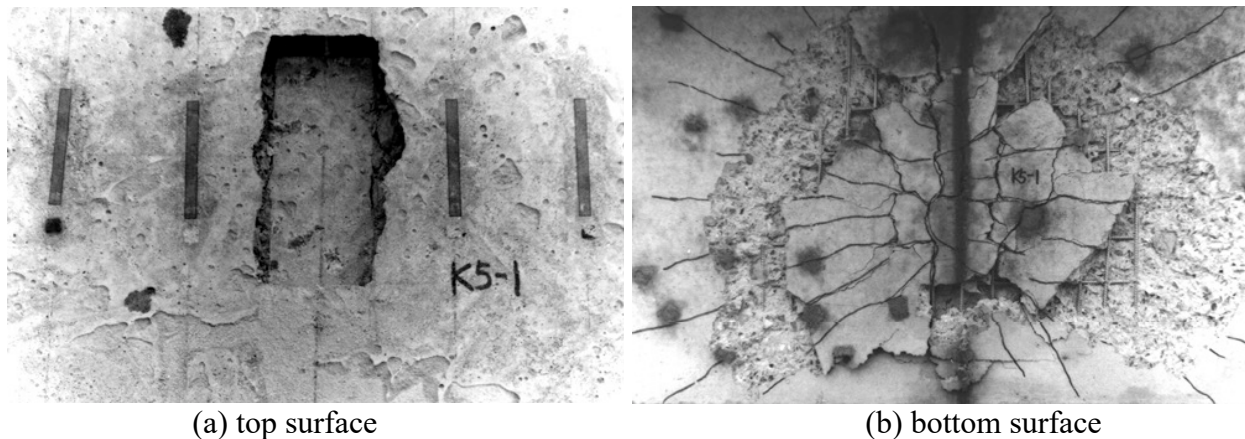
Cracking pattern of punching shear failure of the bridge deck slab (Youn and Chang 1998)
